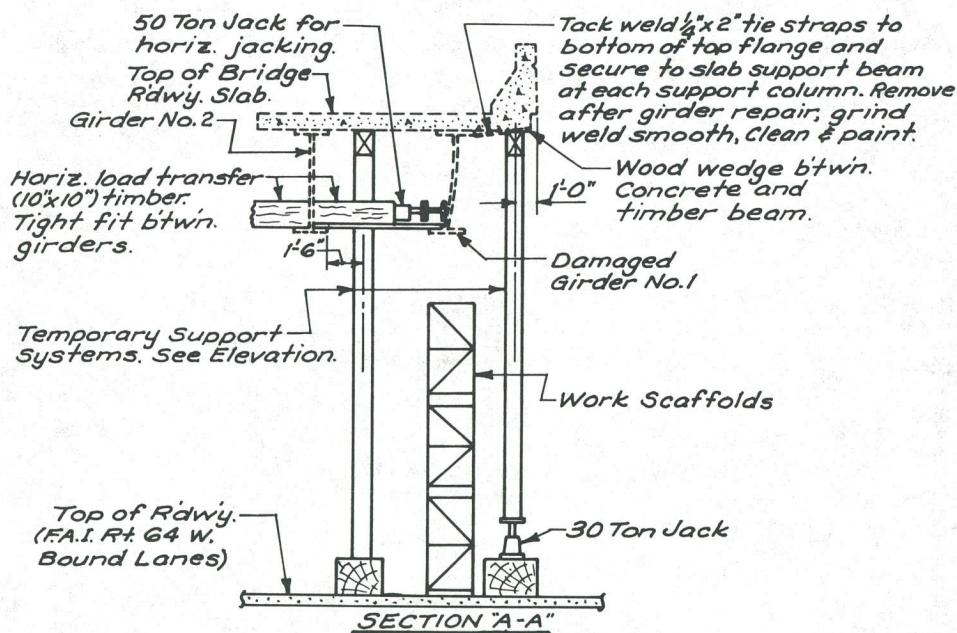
Bridge supports during straightening of girder. (Courtesy Illinois)
